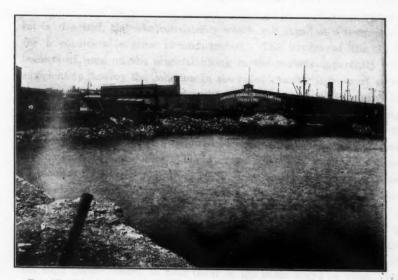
Large Pocket, and Rip-Rap Embankment, West 44th Street.
